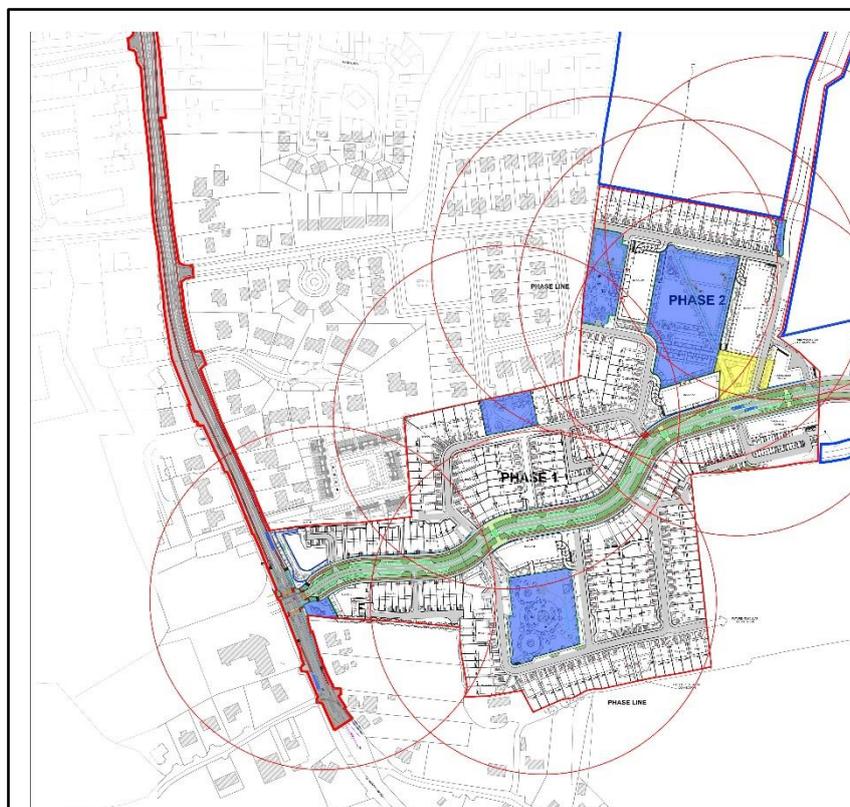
Walkability Plan with 150metre radius imposed on site layout. See also Park Hood Drawing 6473-L-308 enclosed with the planning application
